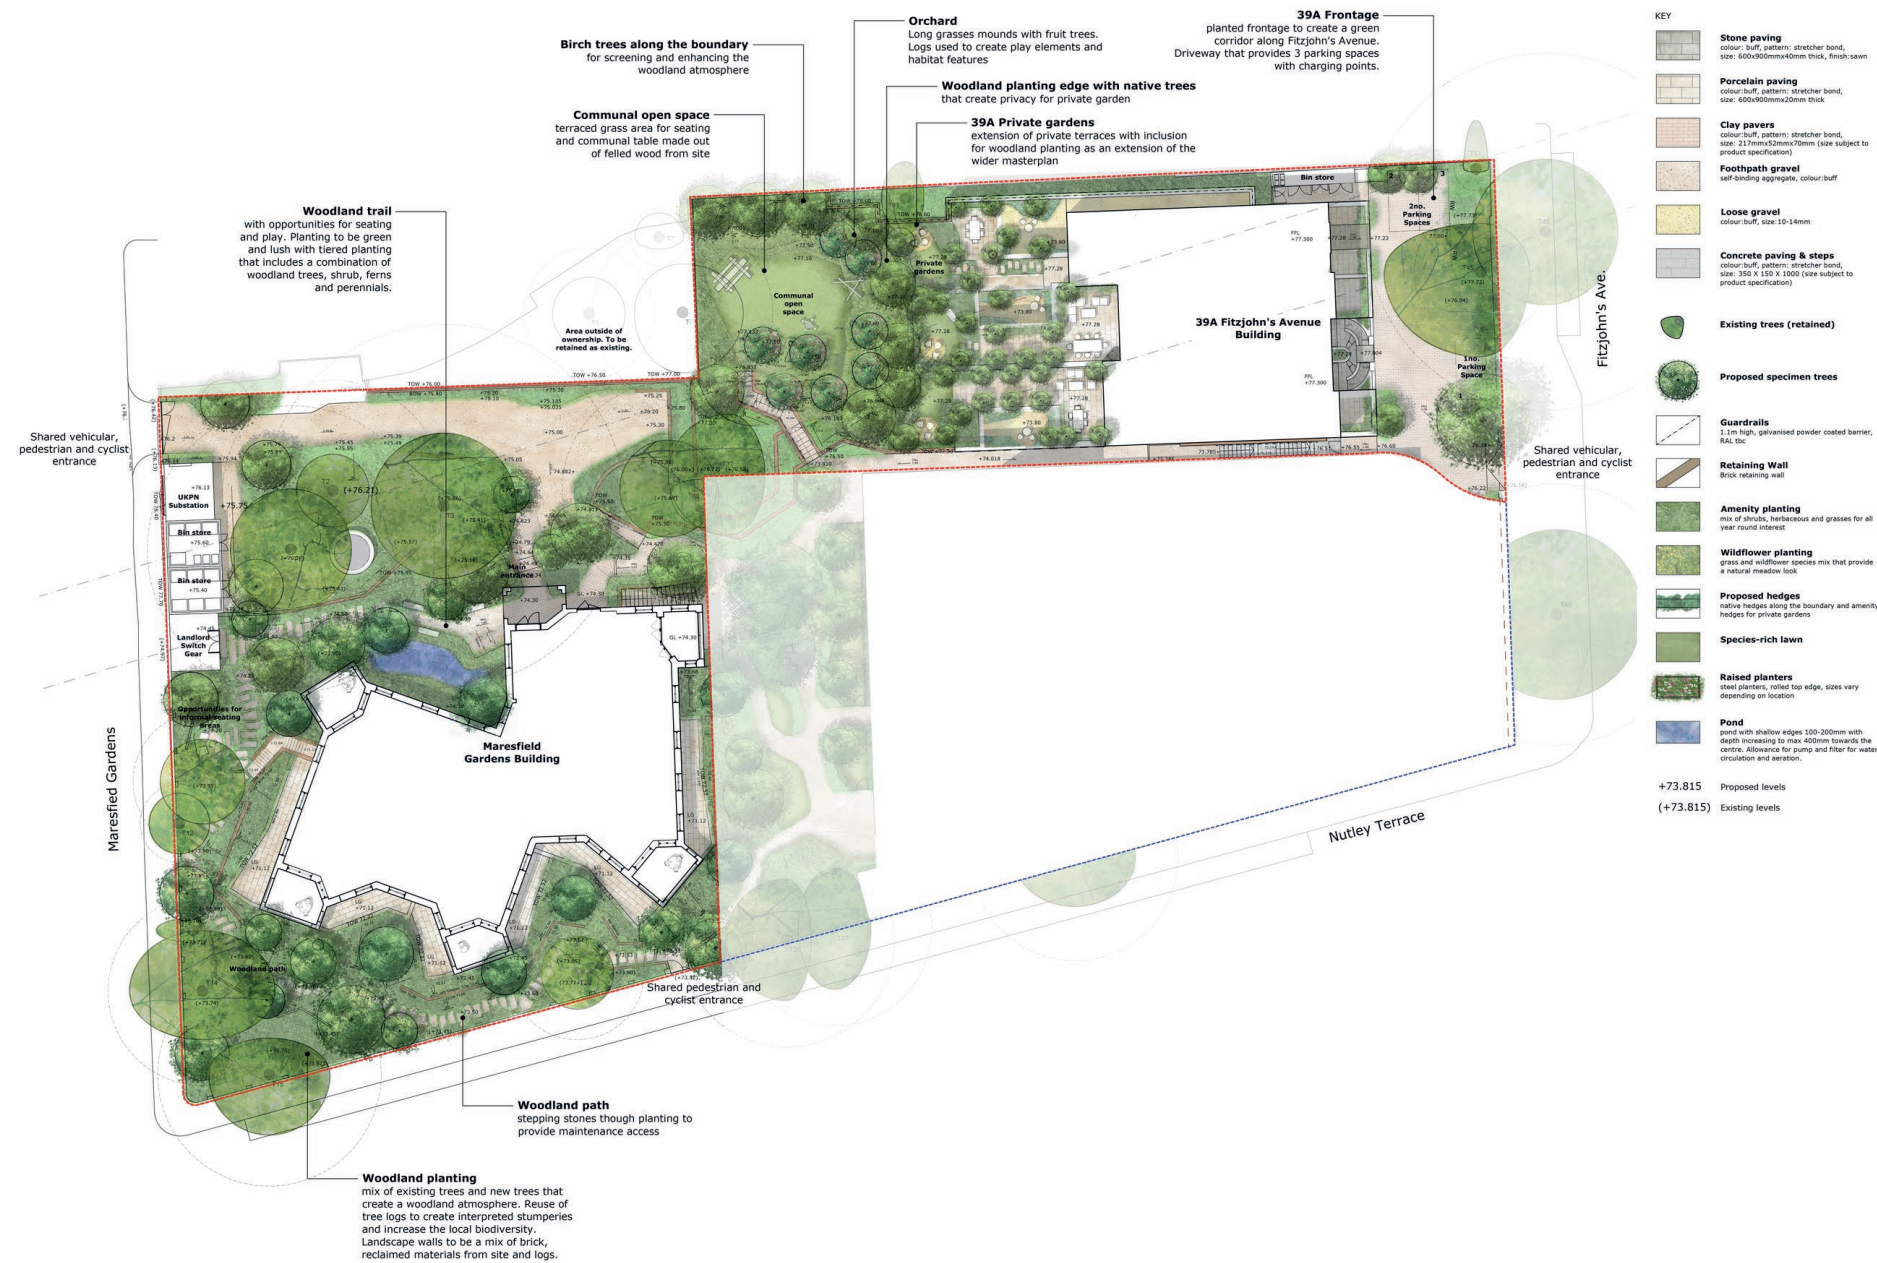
Landscape Masterplan. Source: Bowles & Wyer.
